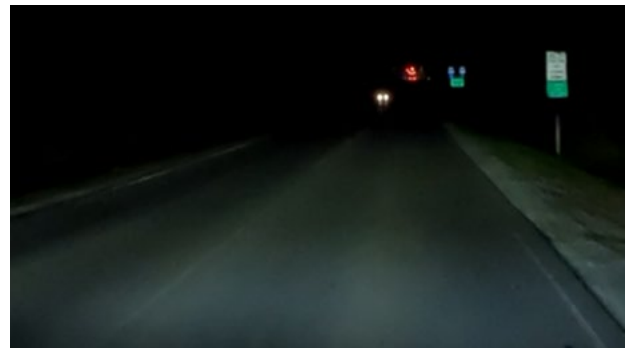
Eastbound on Pratt Road approaching I-530 does not have pavement markings.
